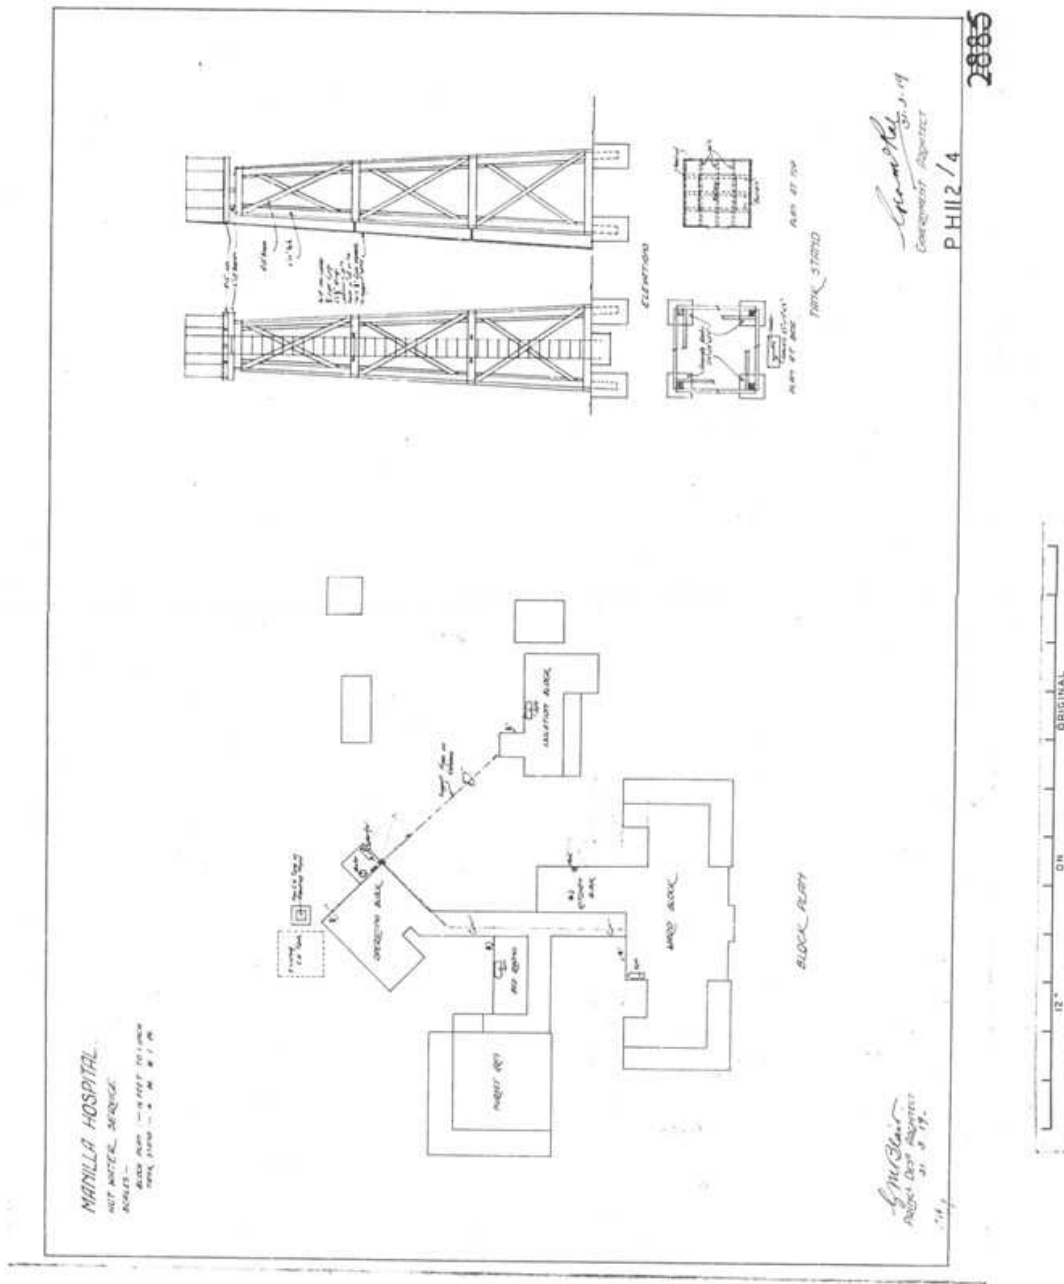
Site Plan of the Hospital in 1919 showing the Isolation Block existing on the site. (Source – OPWS Plan Room)
